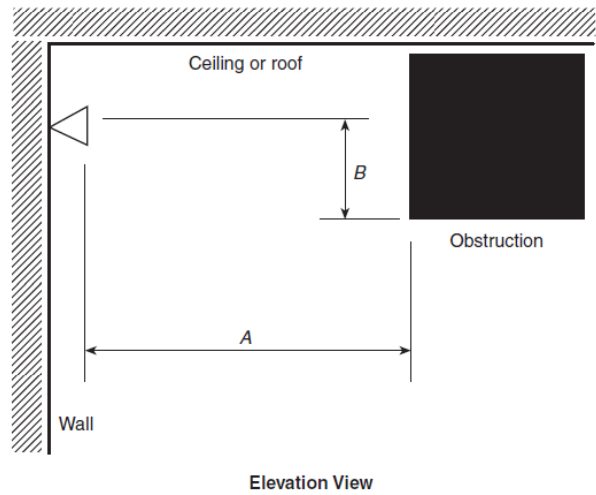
Positioning of Sprinklers to Avoid Obstructions (Extended Coverage Sidewall Spray Sprinklers).
